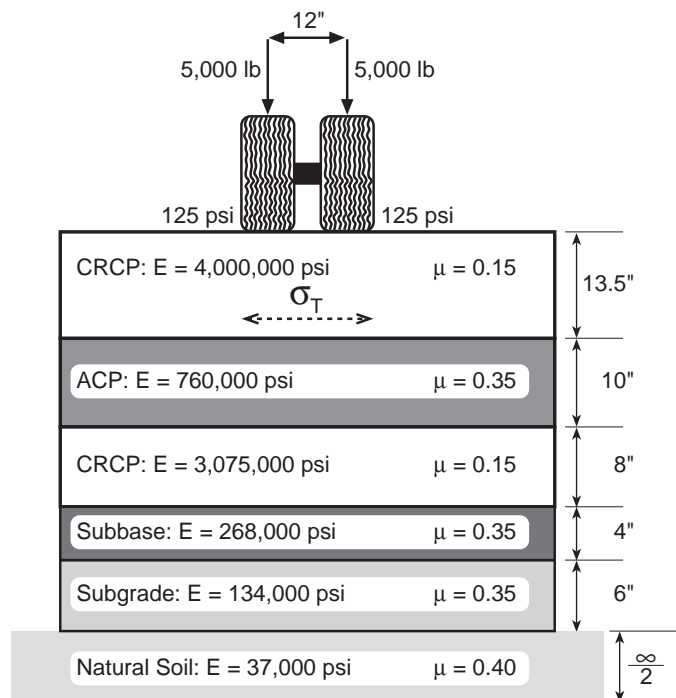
Structure analyzed for the design of the overlay of the existing pavement
